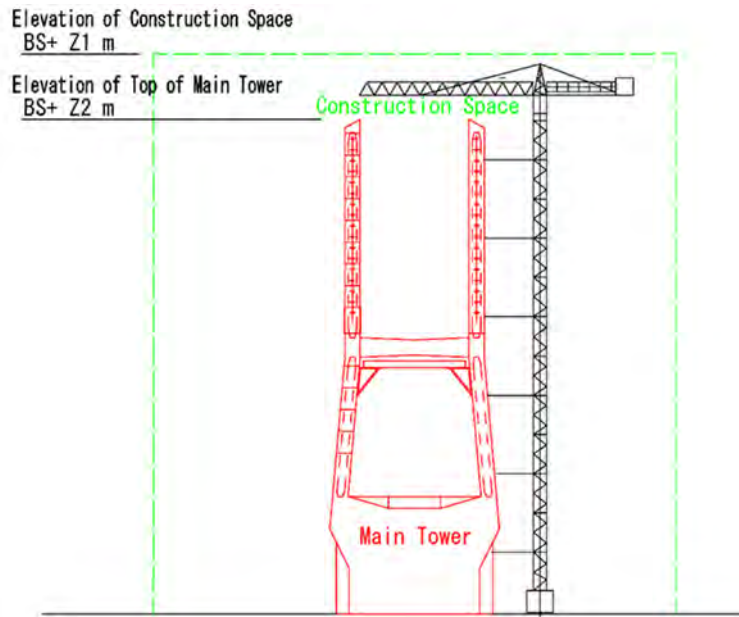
Explanatory Drawing of the Elevation of the Construction Space and Top of the Main Tower
